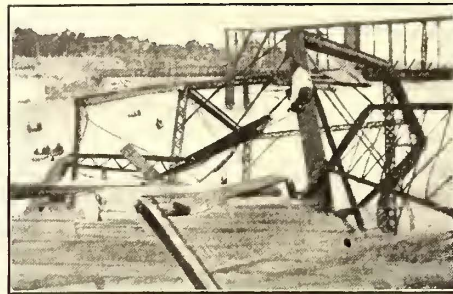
WRECK OF JAMES STREET BRIDGE
